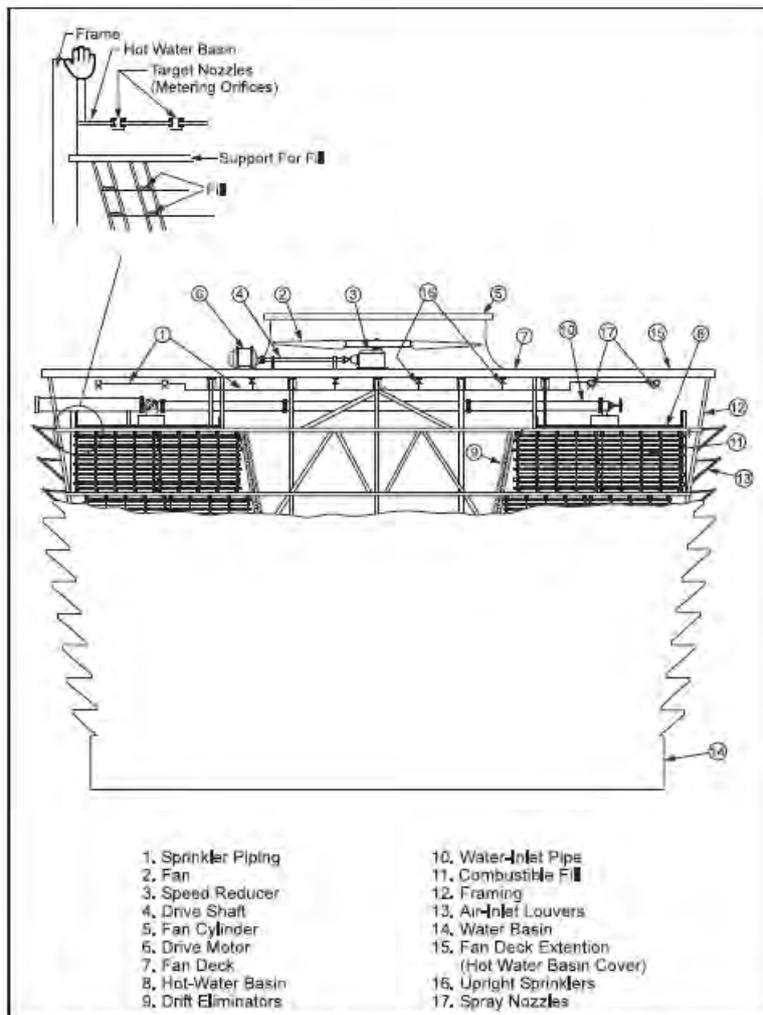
Typical cross section of a crossflow induced-draft cooling tower (covered hot water basin)
